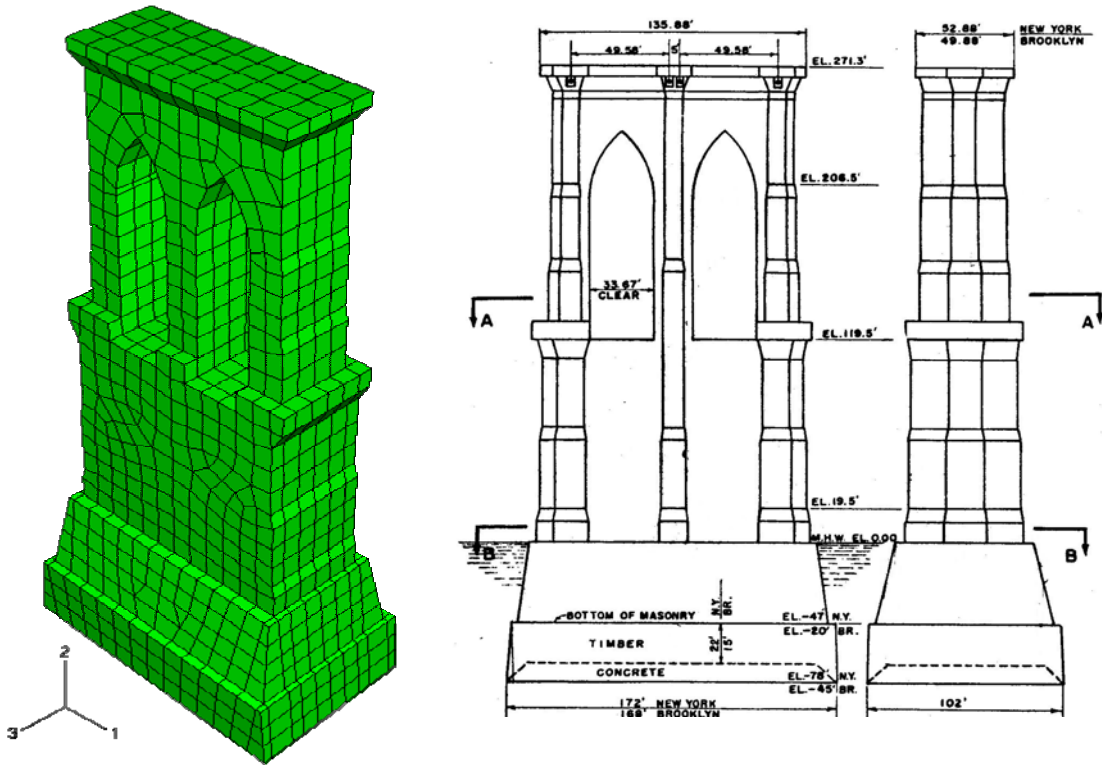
The elevation of the masonry tower (right) and the finite element model (left)
